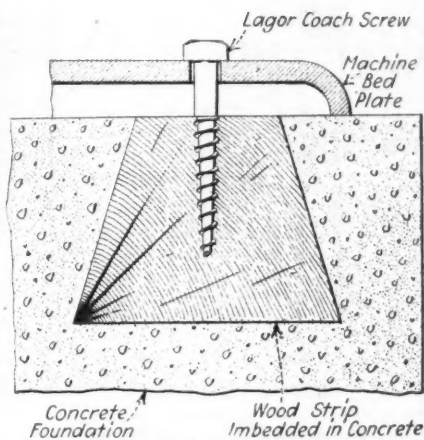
LIGHT MACHINERY SECURED BY LAG SCREWS
